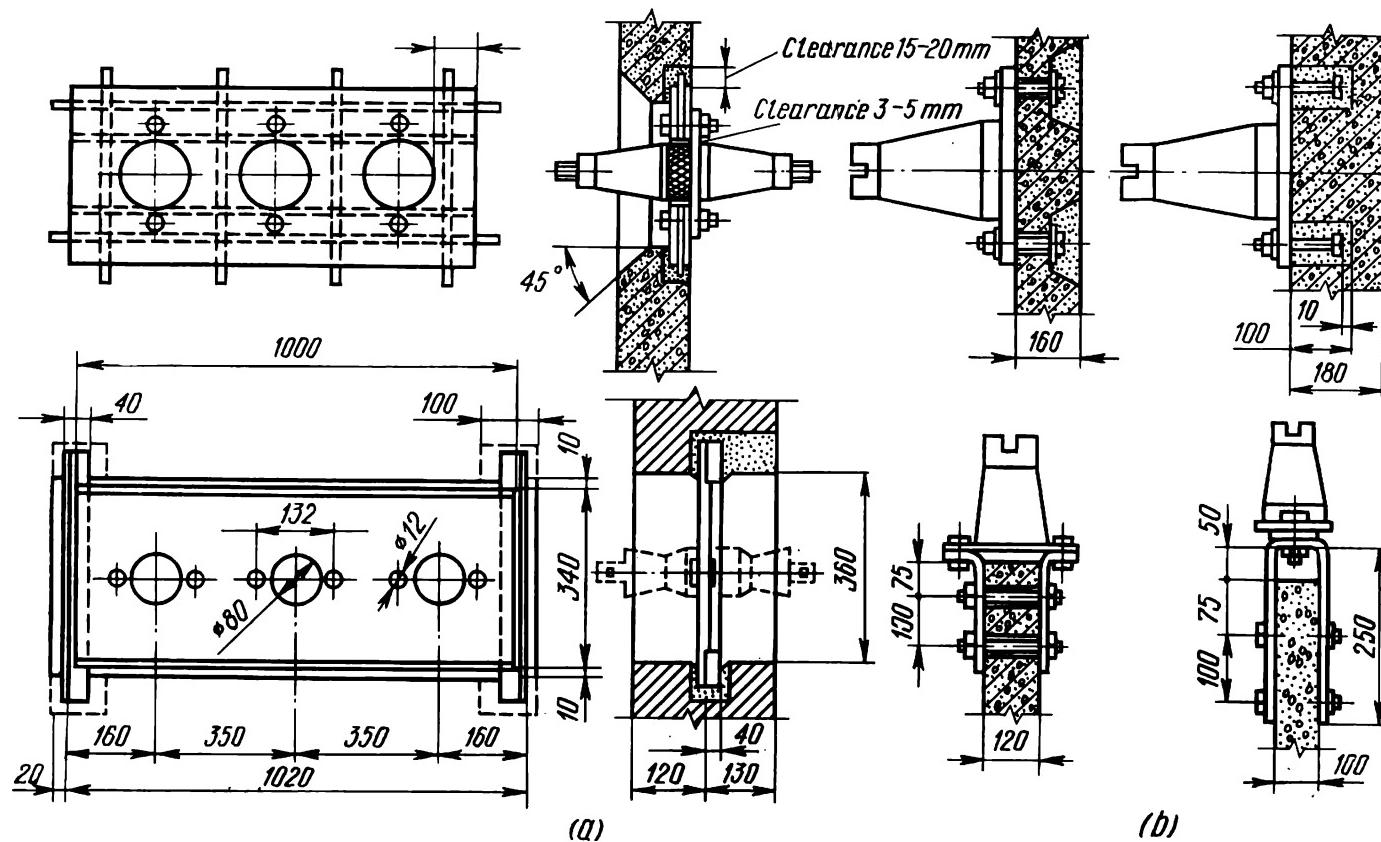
Layout of insulators in an enclosed substation rated 6 and 10 kV
